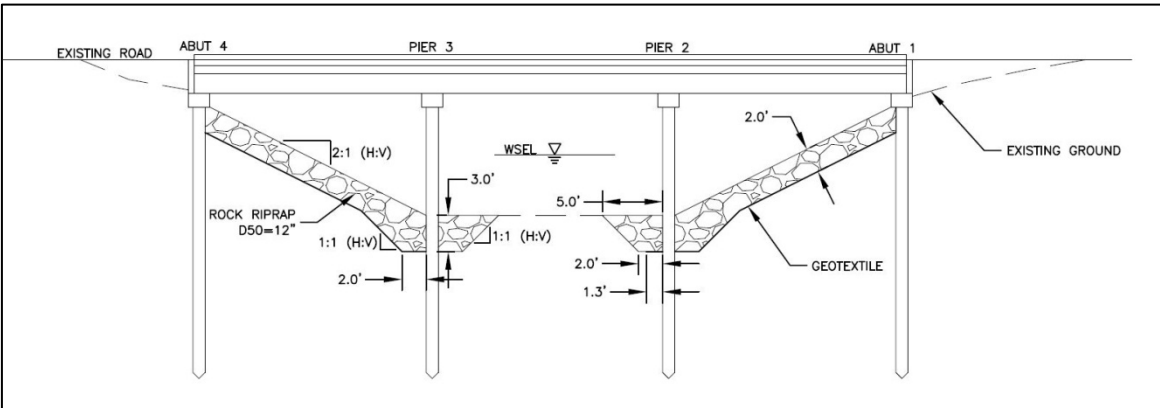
Cross-sectional view of Bridge H-11-U with recommended hydraulic scour countermeasures
